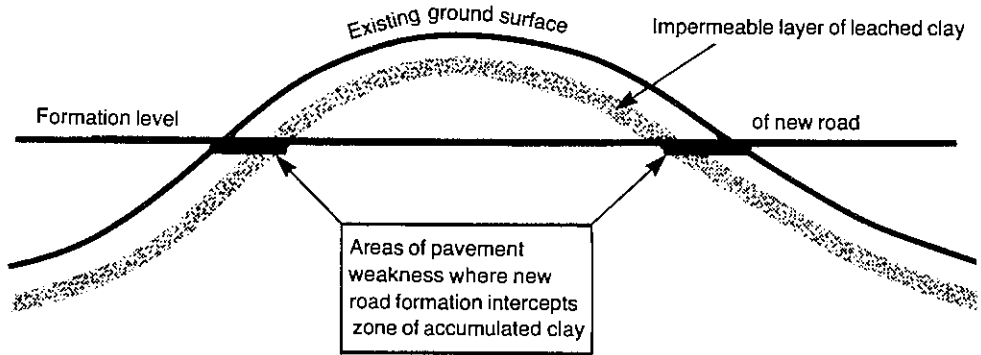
Pavement failures can be caused by perched water tables in residual soils.
